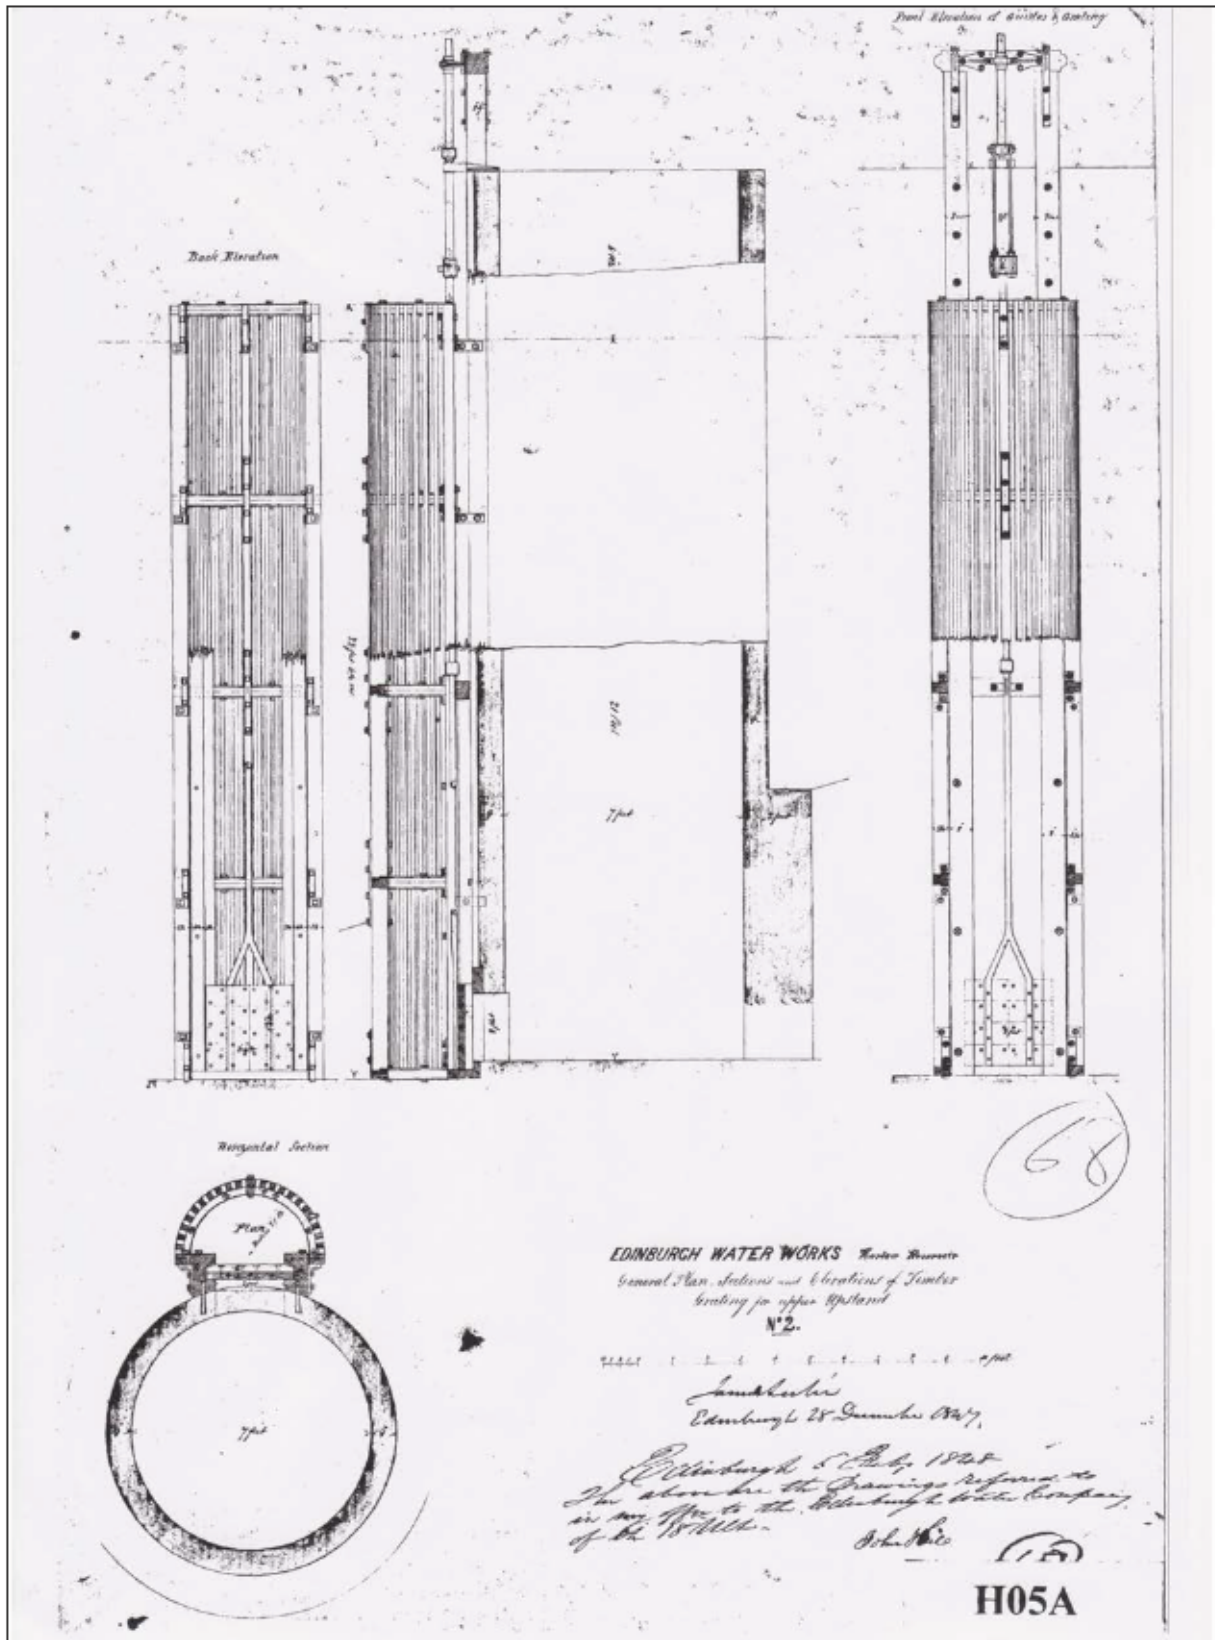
General Plan Sections and Elevation Timber Grating Upper Upstand.
